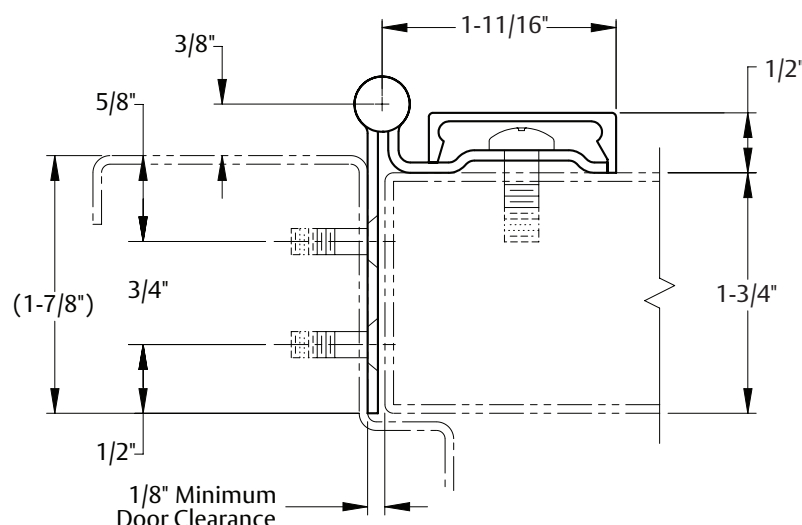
HINGE PLACEMENT & CLEARANCE TEMPLATE
